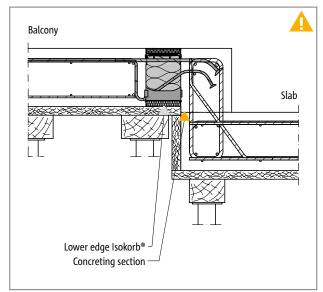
Schöck Isokorb® XT type K-U: In-situ concrete balcony with height offset downwards
